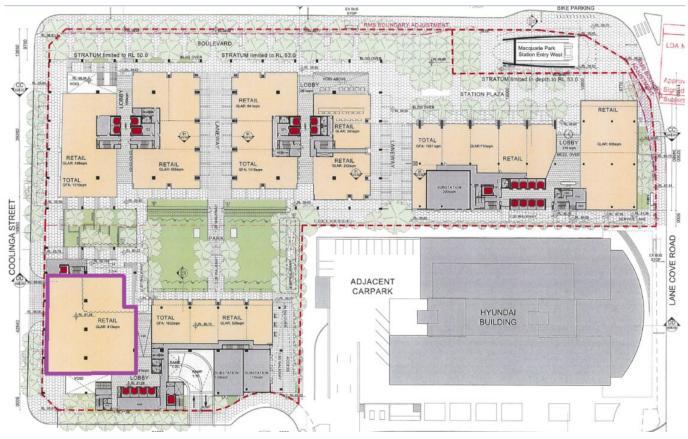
Approved Ground Floor Plan of the Macquarie Exchange Site (Retail Unit 7 identified in purple)Source: Bates Smart
